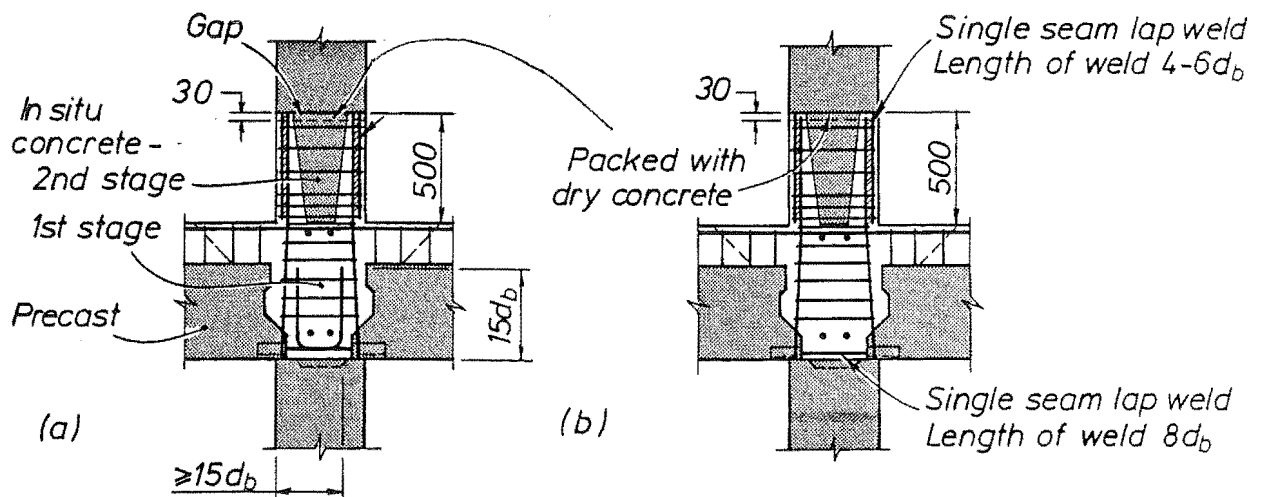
Typical Arrangements of Precast Concrete Frame Systems Used in China.
